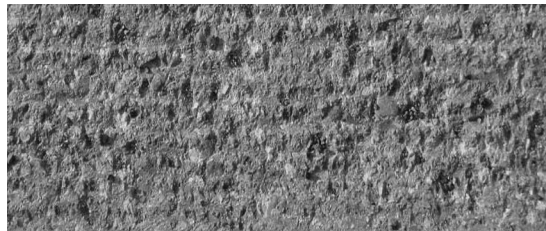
Photo of the surface texture of a groove made with a flail-head grinder-type cutting head.
